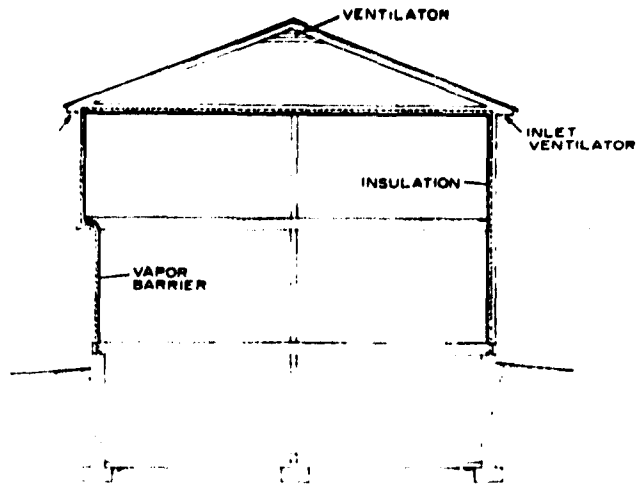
Location of vapor barriers and insulation in full two-story house with basement. M 139 226
